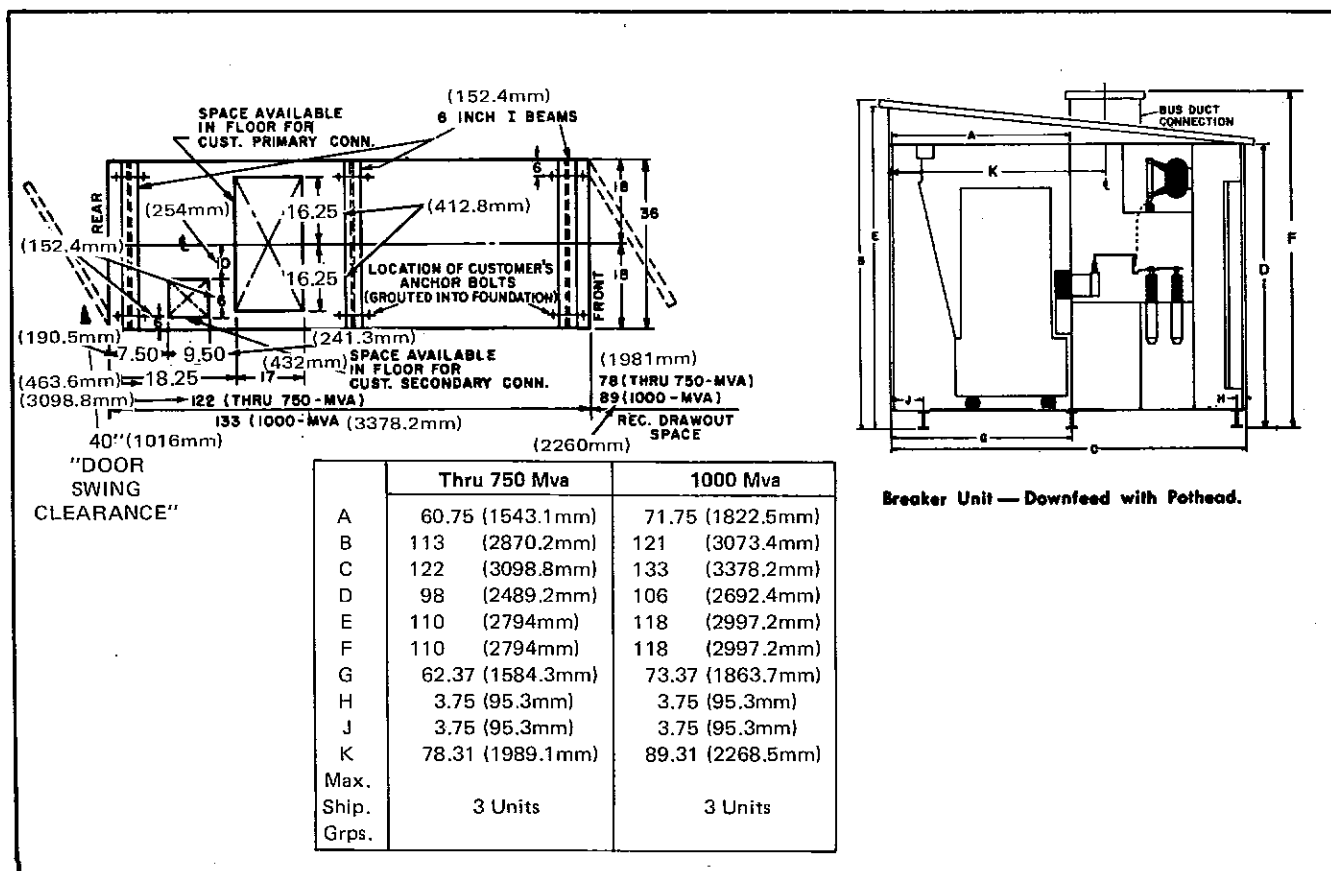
Floor Plan and Typical Side View of 15 kV Conventional Outdoor Cubicles
